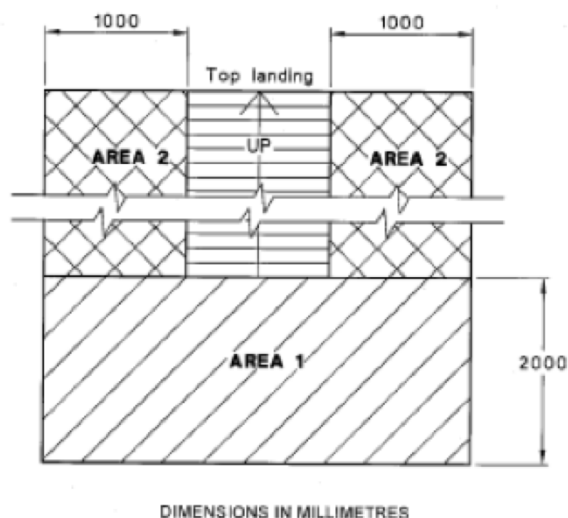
PLAN FOR STAIRWAY GLAZING ZONE
